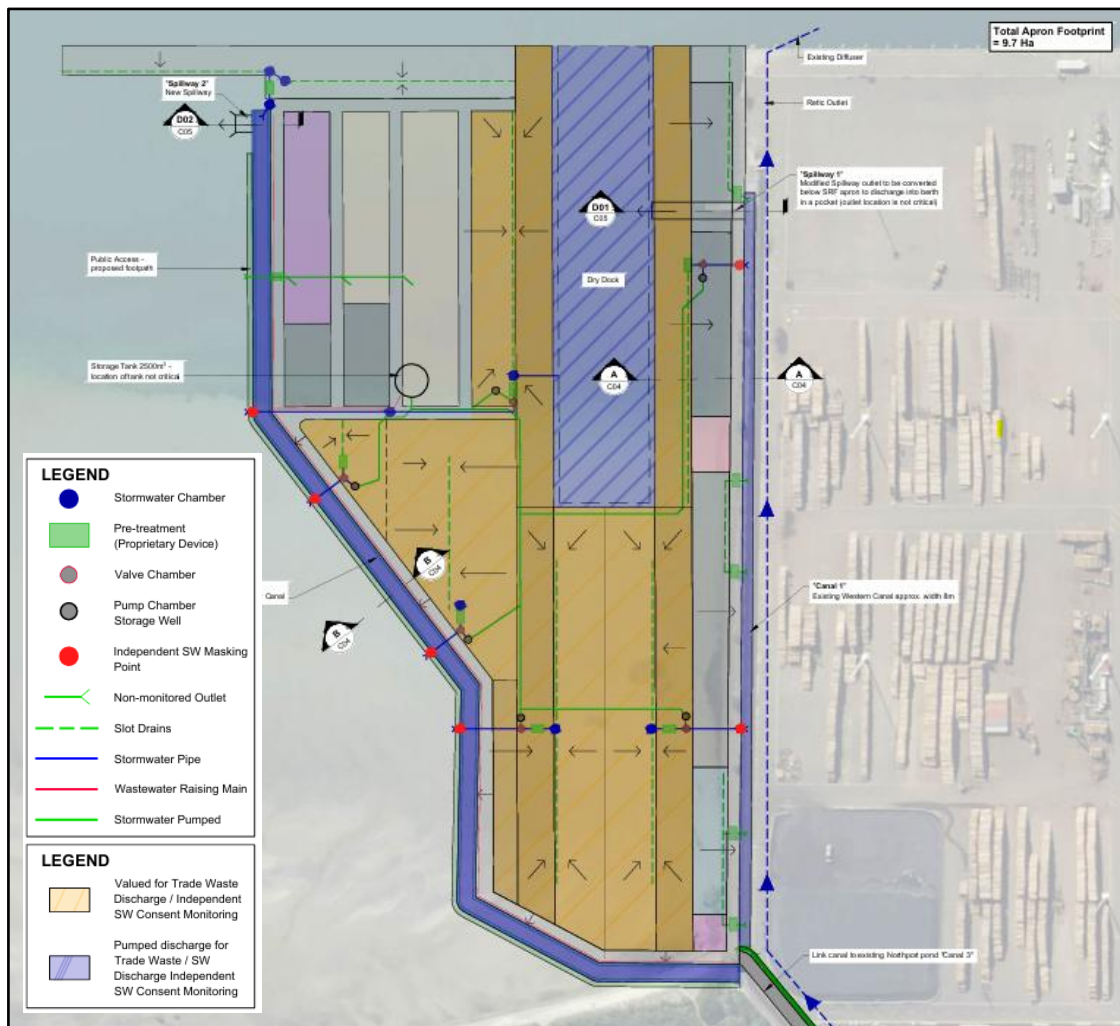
Indicative shipyard stormwater and operational-runoff drainage layout
